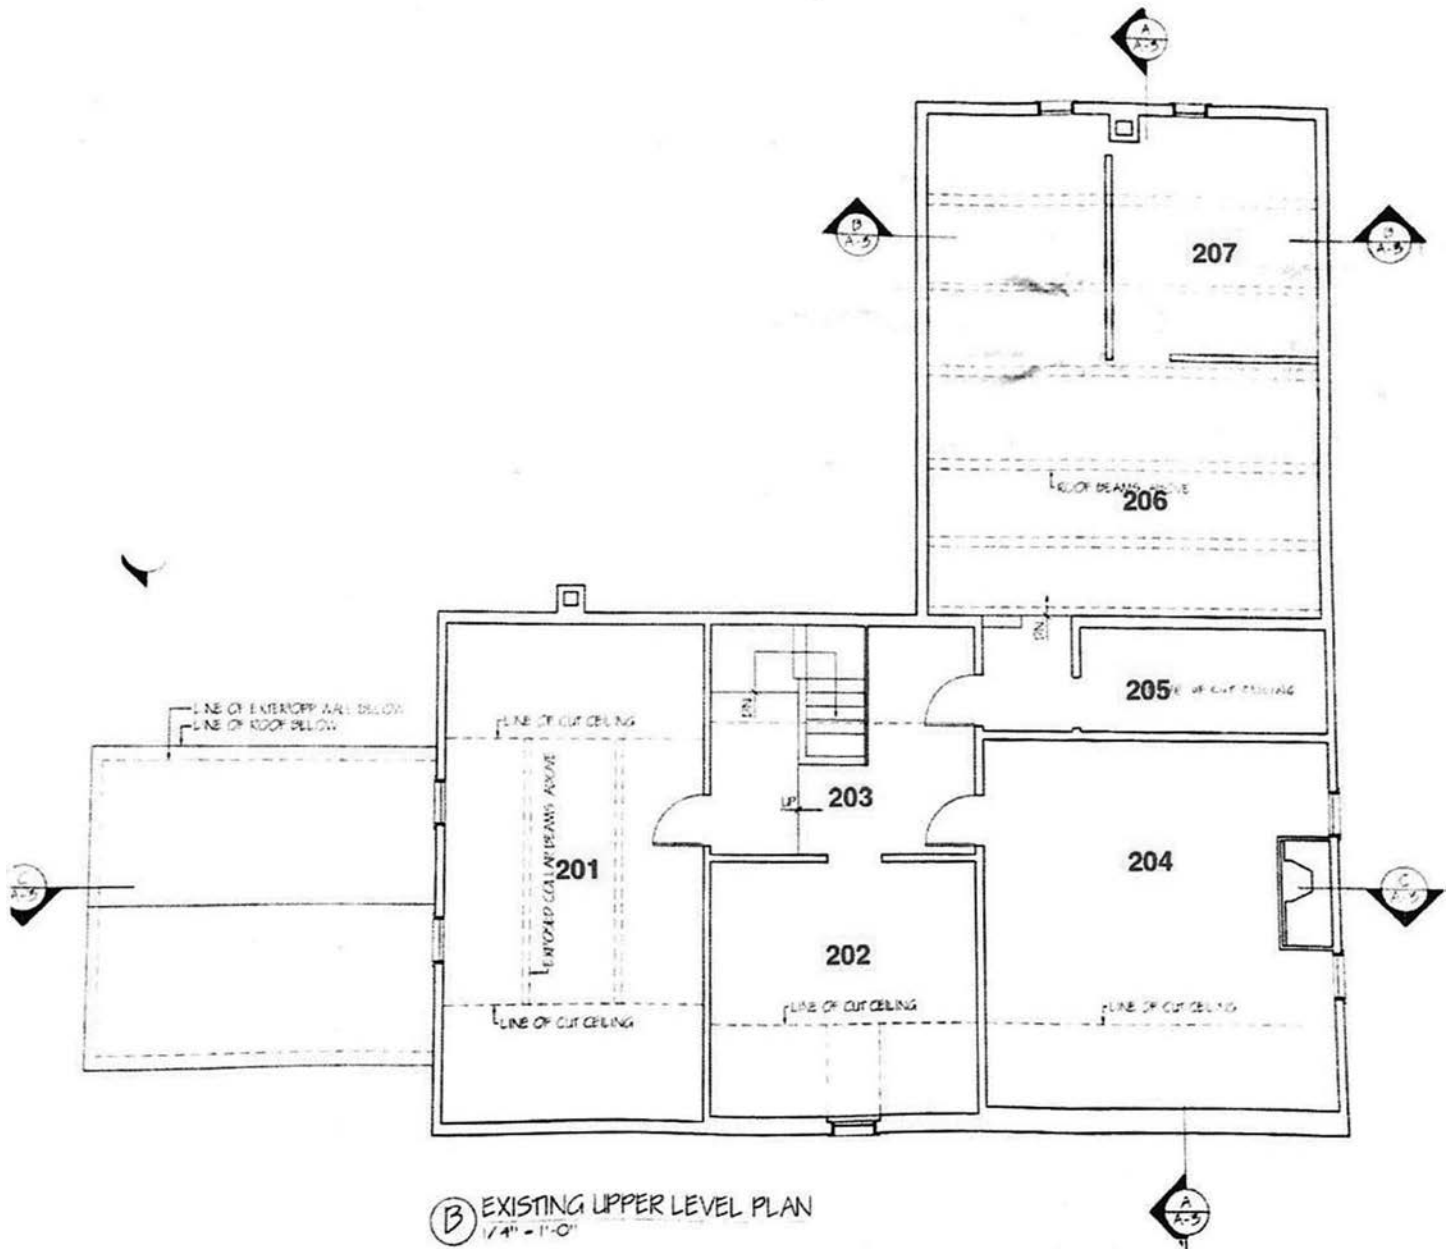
Second floor plan. Drawing by Diane Reimer, 2004.
